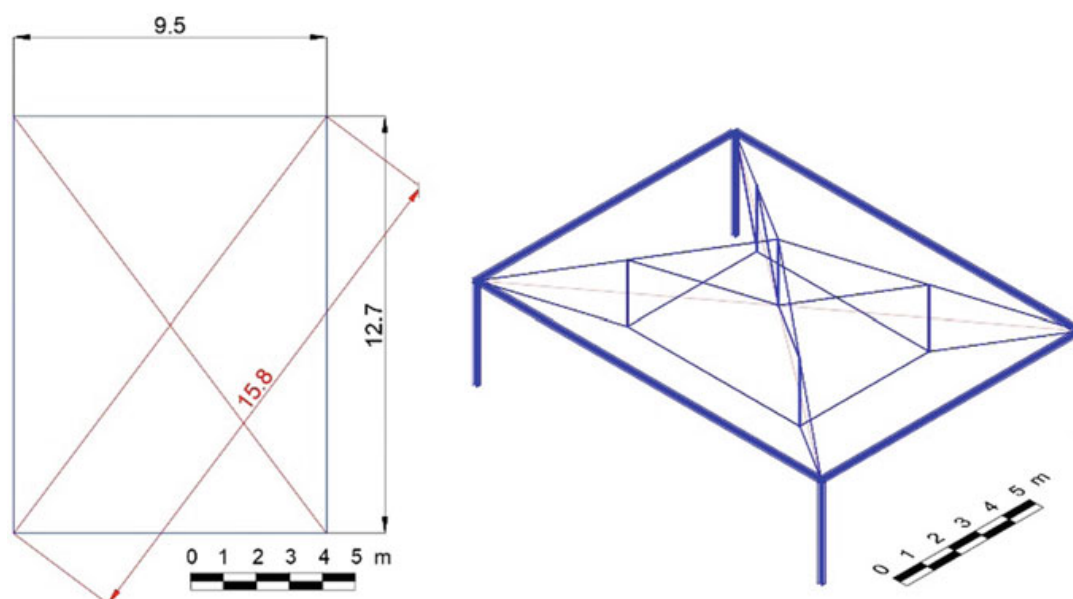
Axonometric view and plan of the proposed model for the tensile-greenhouse
